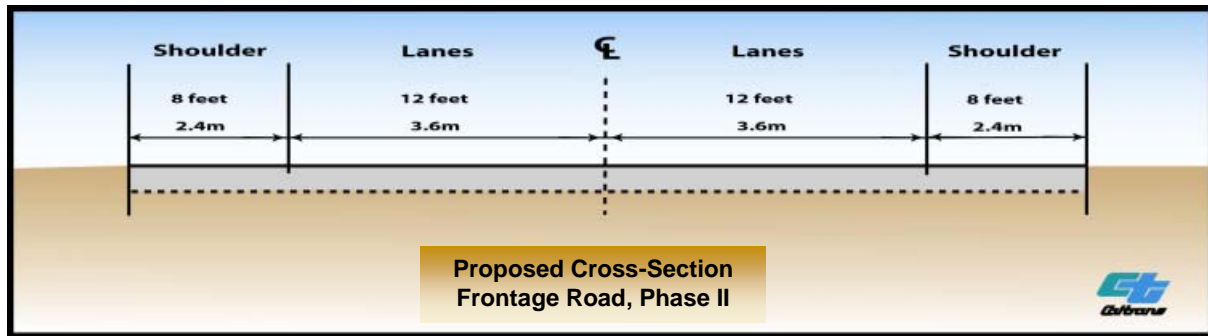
Proposed Cross-Section, Frontage Road, Phase II
